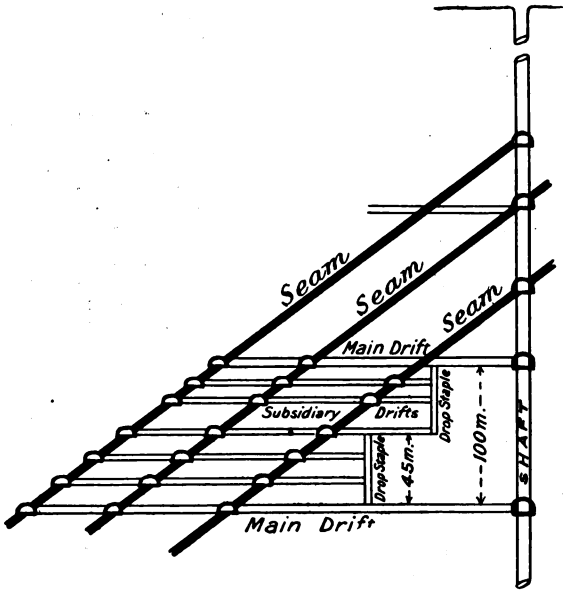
Section at Gelsenkirchen Colliery, Westphalia, showing an arrangement of Cross-measure Drifts and Subsidiary Drifts connecting the Workings in the Highly Inclined Seams with the Shafts.
